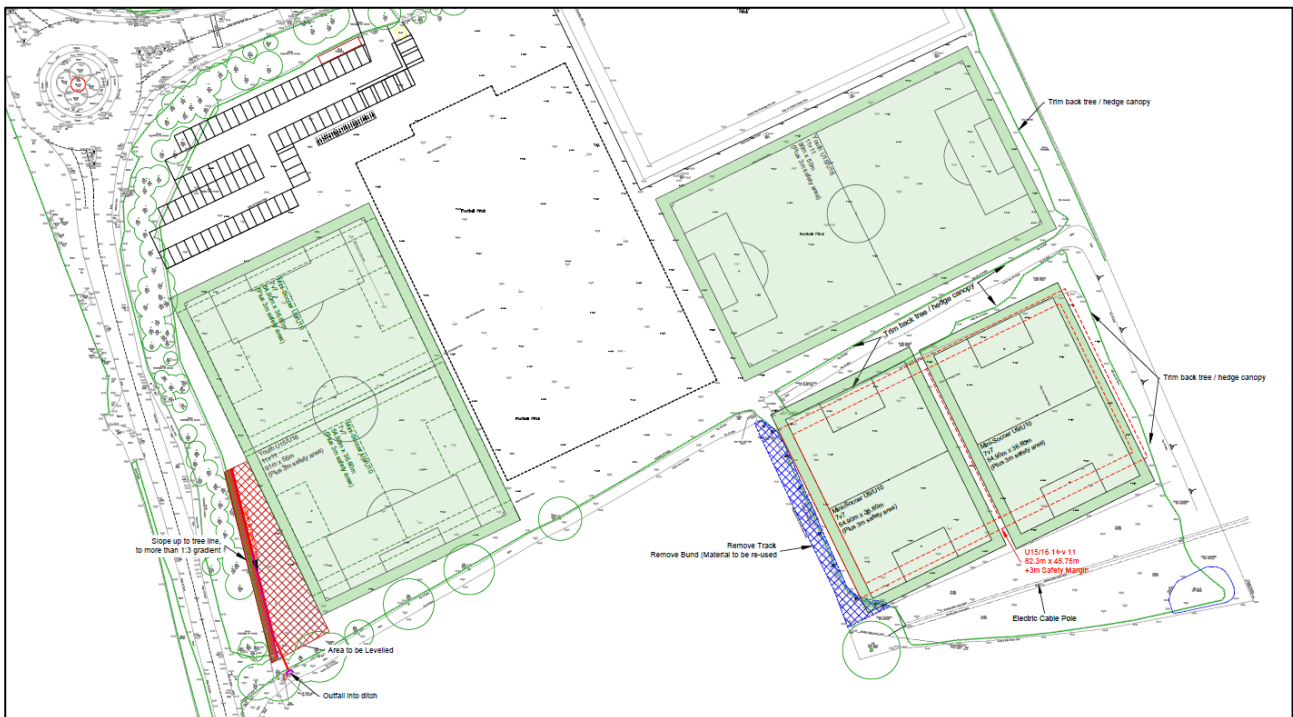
A. Proposed pitch reconfiguration (maintaining existing pitch area boundaries).
